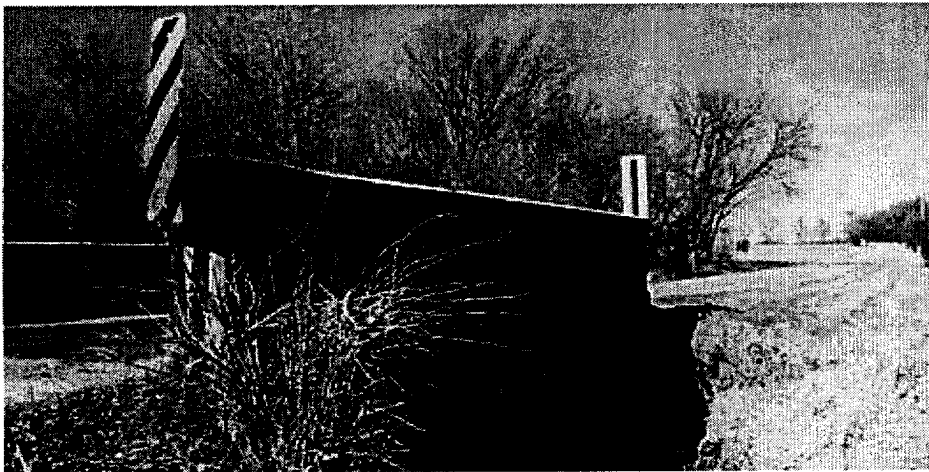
Bridge P-53-702 over Saunders Creek in City of Edgerton
